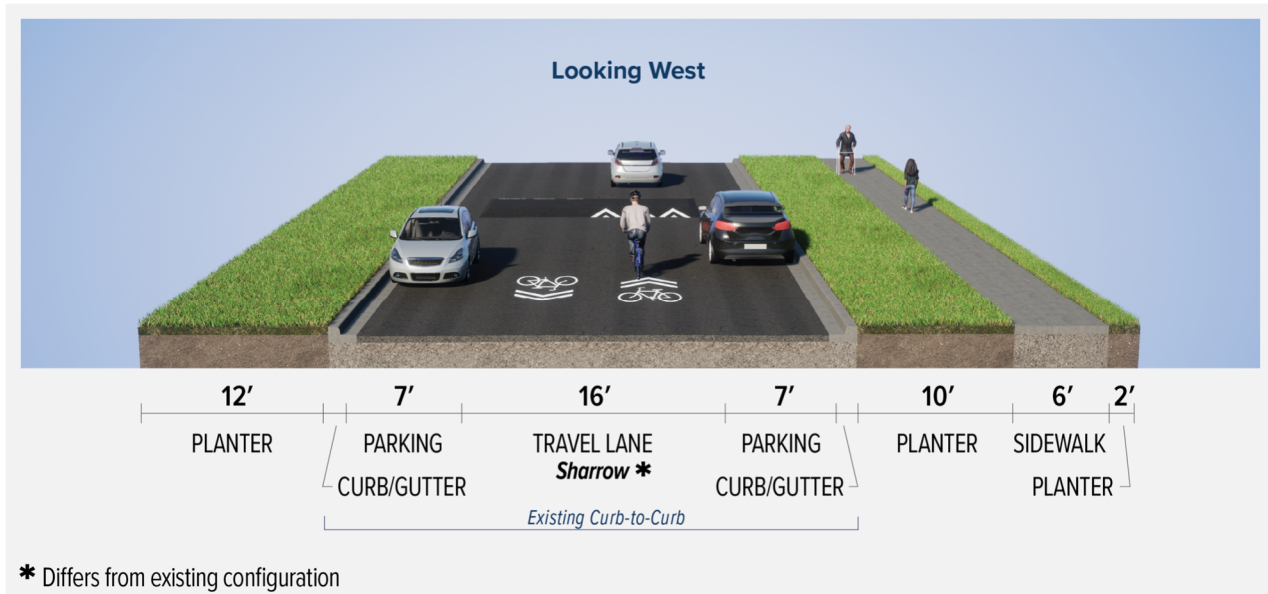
ALTERNATIVE 1 BETWEEN 4TH STREET AND 5TH STREET
